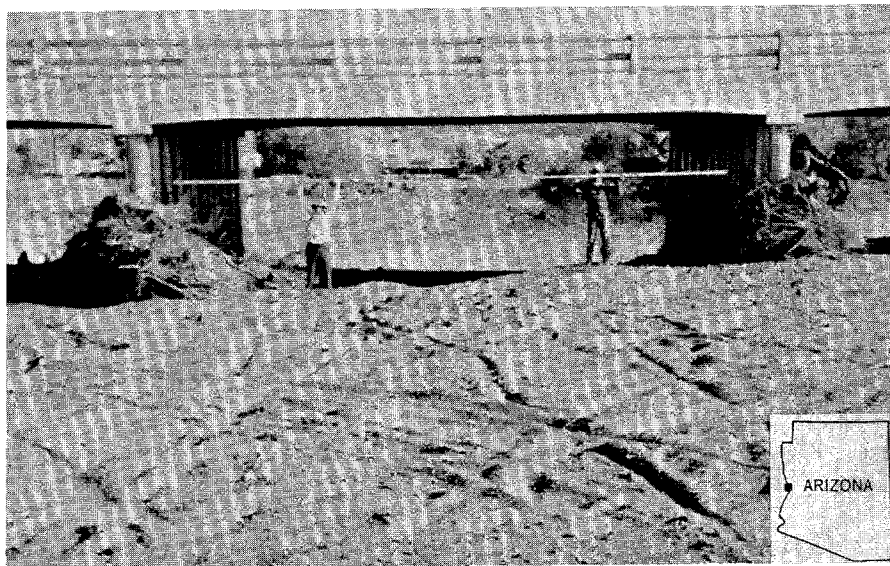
Upstream view of pile bents at piers 2 and 3 showing debris at bridge. Level rods are held at approximate water-surface elevation of 1976 flood. (From Arizona Dept. of Highways.)
